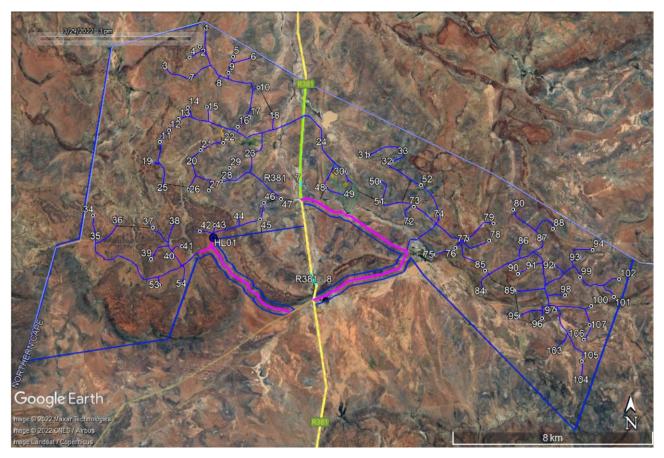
Layout of Hoogland 1. Site boundary and road layout in blue, public road upgrade in green and shared infrastructure in purple.
